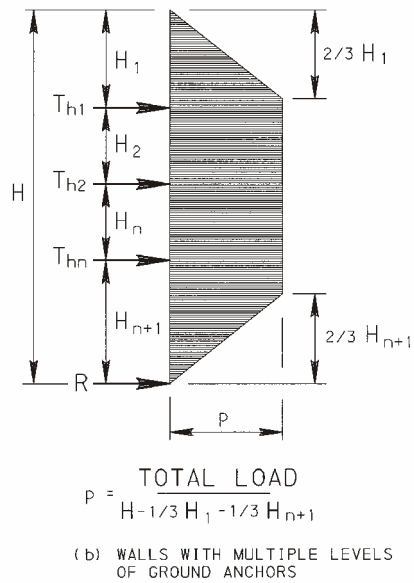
(b) – Apparent Earth Pressure Distribution for Anchored Walls Constructed from the top down in Cohesionless Soils
